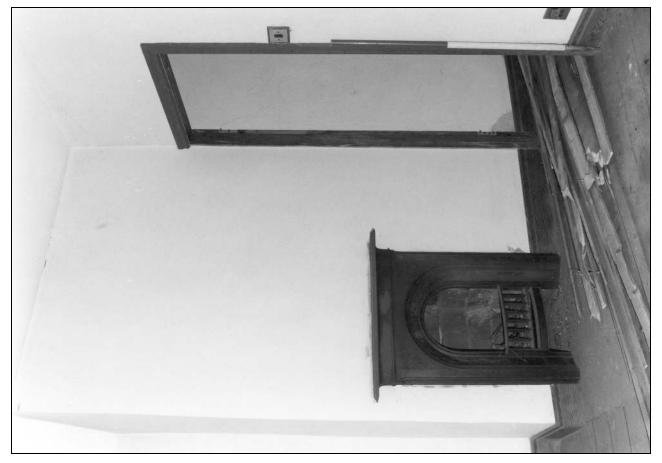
Bedroom 2, from the south-east (film 5, frame 1)
